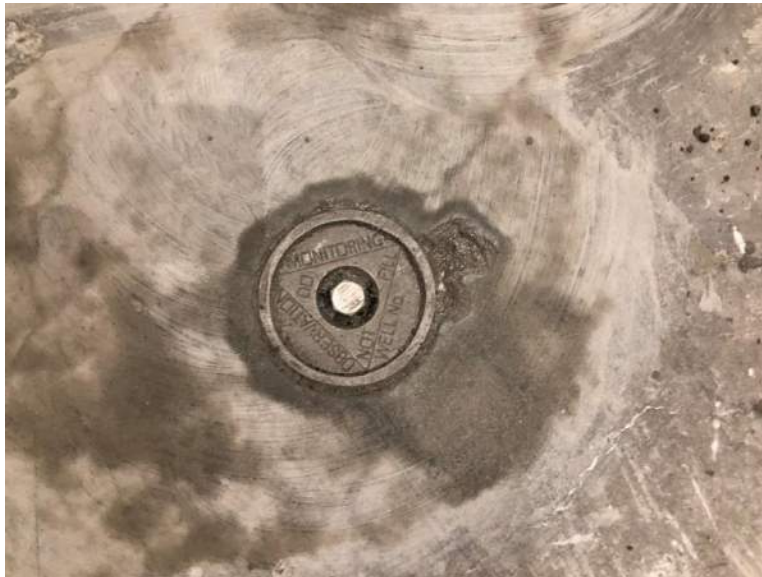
View of 4-inch manhole cover installation at soil vapor monitoring point SVMF-04A.
